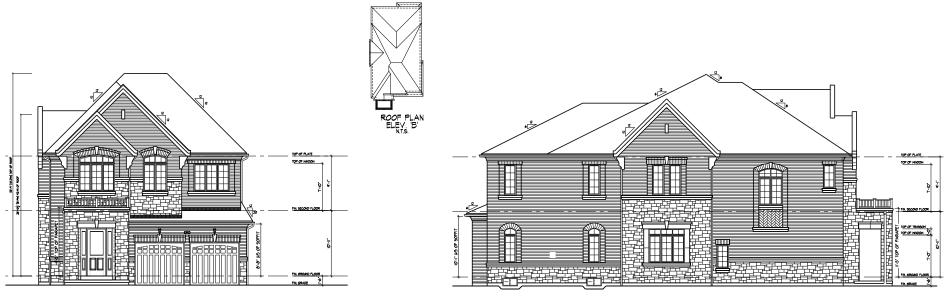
Unit 4105 (Corner) - Front (left) and Flankage (right) Elevation 'B'.
